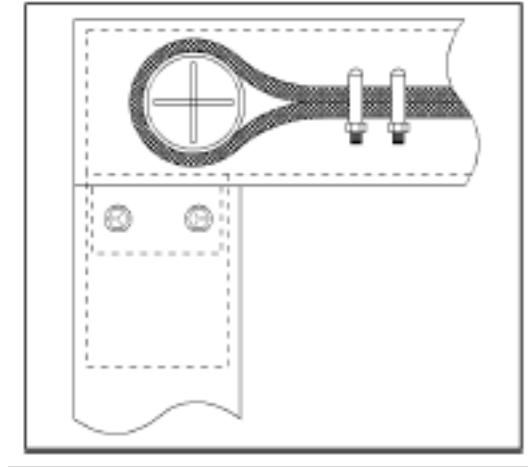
View of Security Cable as Connected inside Barrier Gate (Left Side Shown)
